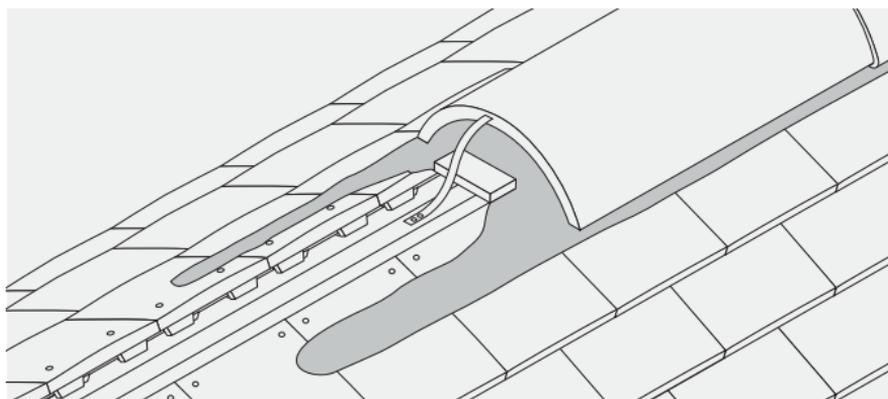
Typical bedded ridge with traditional galvanised security wire
